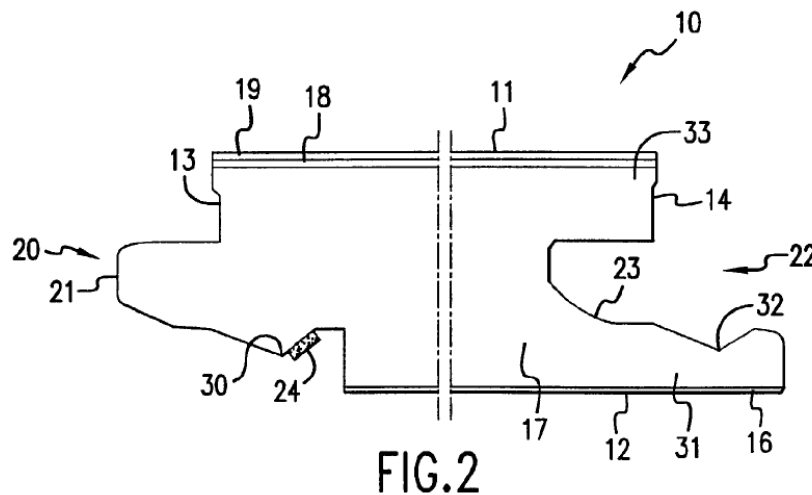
shows “a cross-sectional side view” of floor covering panel 10. Ex. 1004, 2:40–41, 2:60–61. Floor covering panel 10 has first generally planar surface 11, second generally planar surface 12, first side edge 13, and second side edge 14. *Id.* at 2:60–65.
